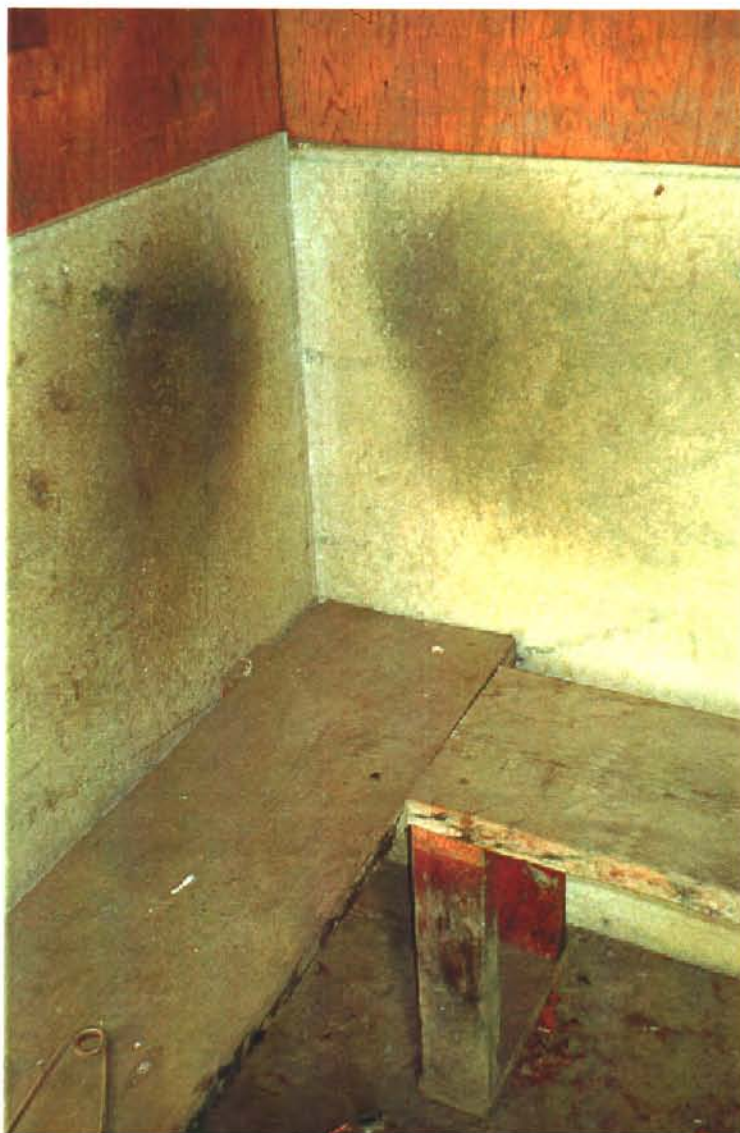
Interior of the lunchroom. Note the asbestos board on the walls.
